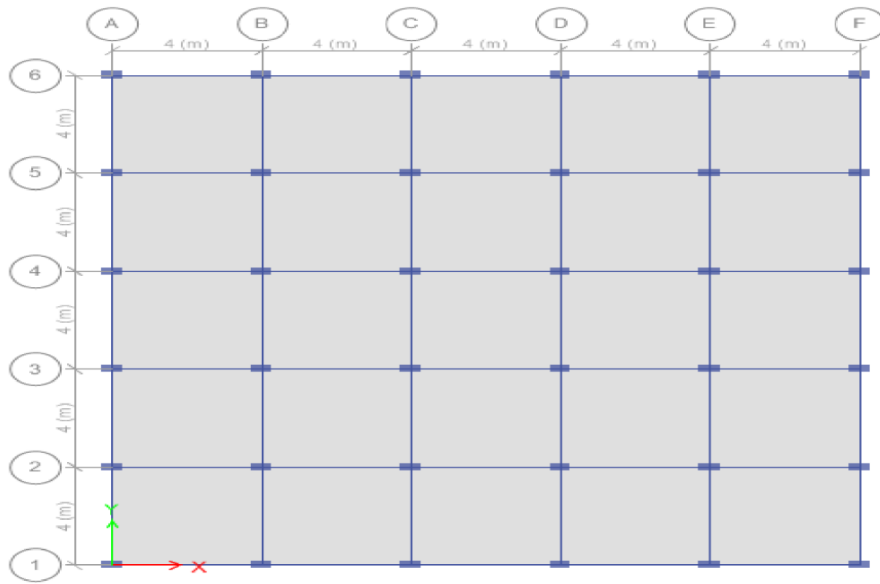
Plan of G+6 & G+9 Framed Structure.
